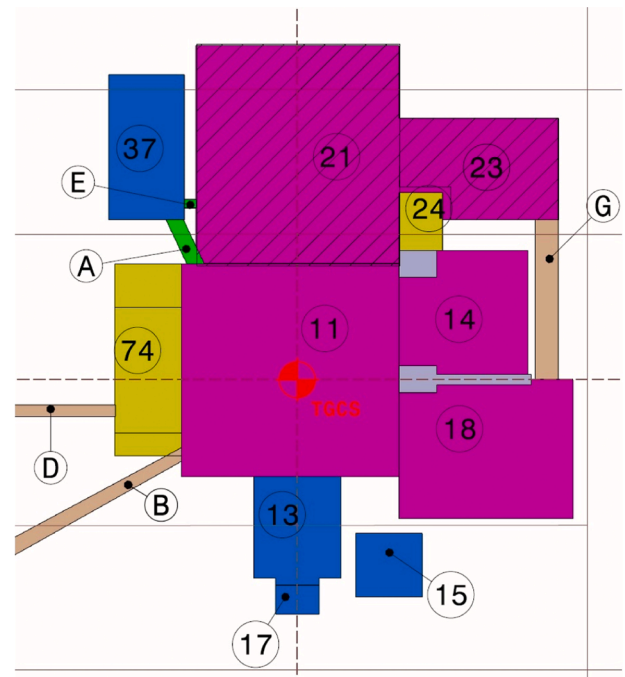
Preliminary VNS site layout (partial) with 11 tokamak building, 13 assembly building, 14 tritium building, 15 RF heating building, 17 cleaning facility, 18 chemical and volume control system (CVCS) building, 21 AMF, 23 radwaste building, 24 personal access control and emergency control room, 37 NB high voltage power supply building, 74 diagnostic building, bridges A and E for the NB power supply cables to the NBI injectors and the NBI test stand, bridges D and B for the coil power supply connections to the magnet system and for cryo-lines, bridge G for the CVCS connection with the radwaste building.
